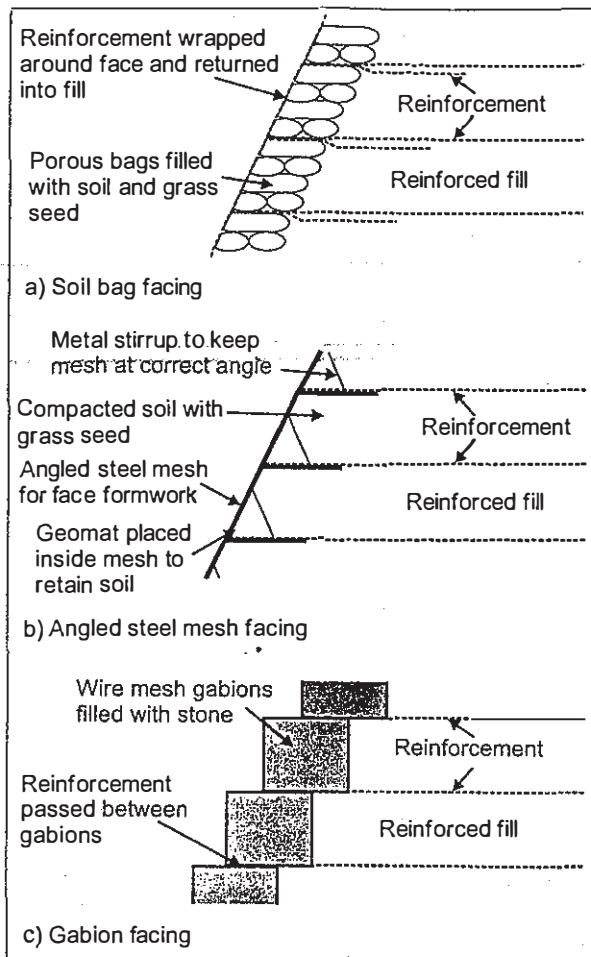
Three common facing techniques for steep reinforced slopes in Asia.
